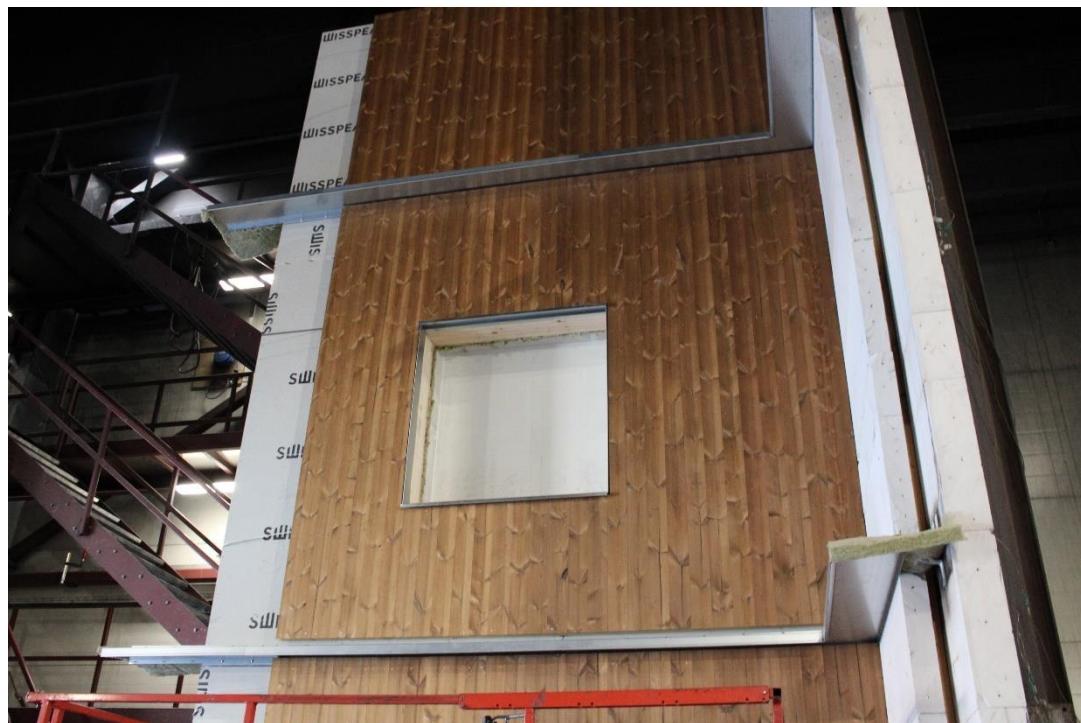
Vertical cladding mounting done. Insulation inside flame deflectors mounted.
